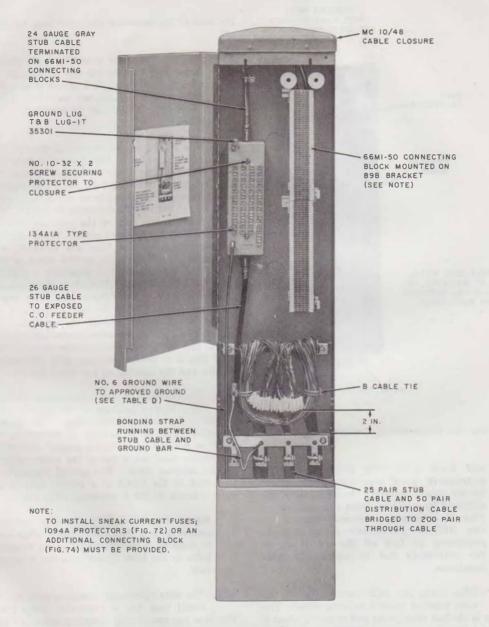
134A1A-25 Protector Installed in Cable Closure
